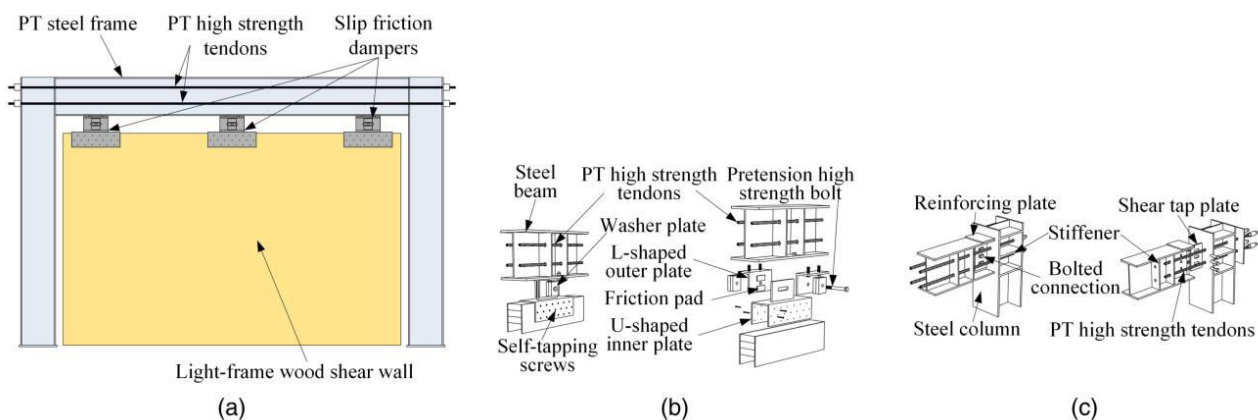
Self-centring steel timber shear wall with slip-friction dissipators: (a) system layout; (b) slip-friction dissipator; and (c) PT connection (Li et al., 2021)
